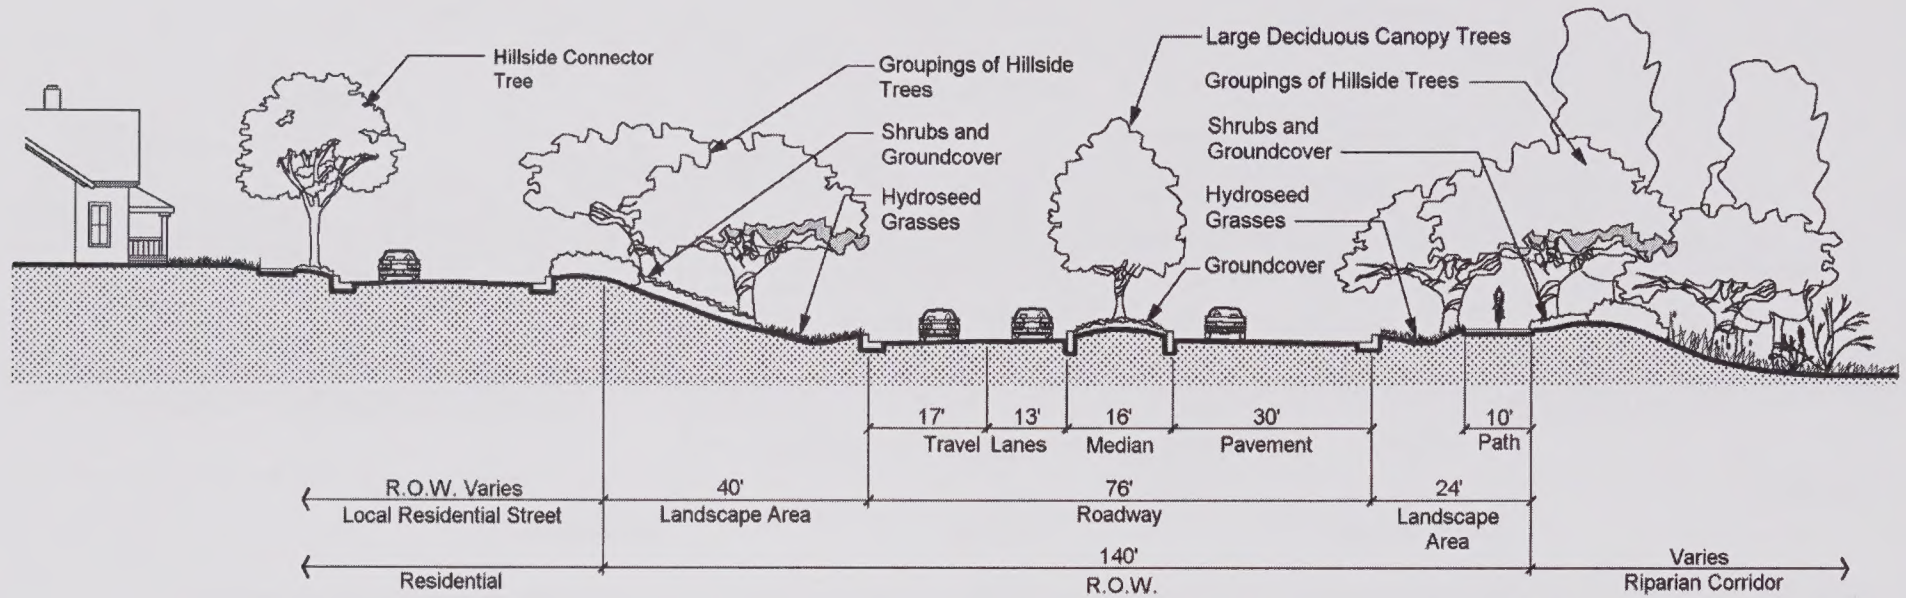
SECTION J – HARTMAN ROAD BETWEEN JENSEN ROAD AND CALLE LAS POSITAS
